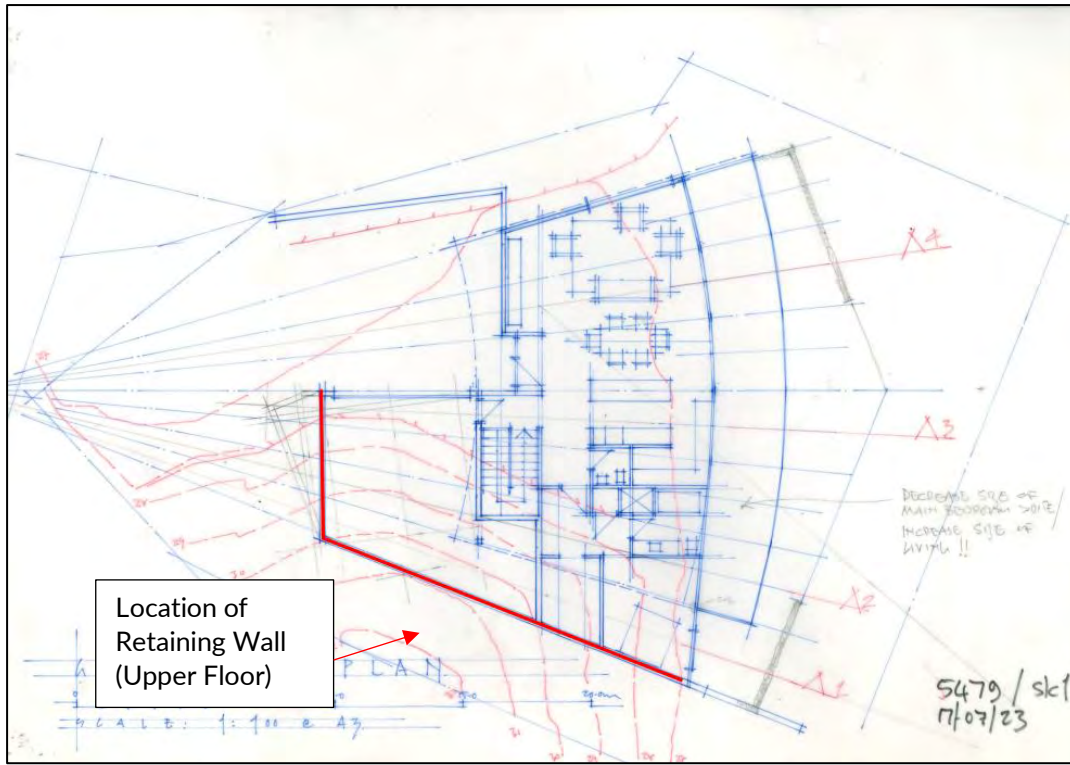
Retaining wall Location Plan for the Upper Floor (i.e. garage) at 27 mRL
